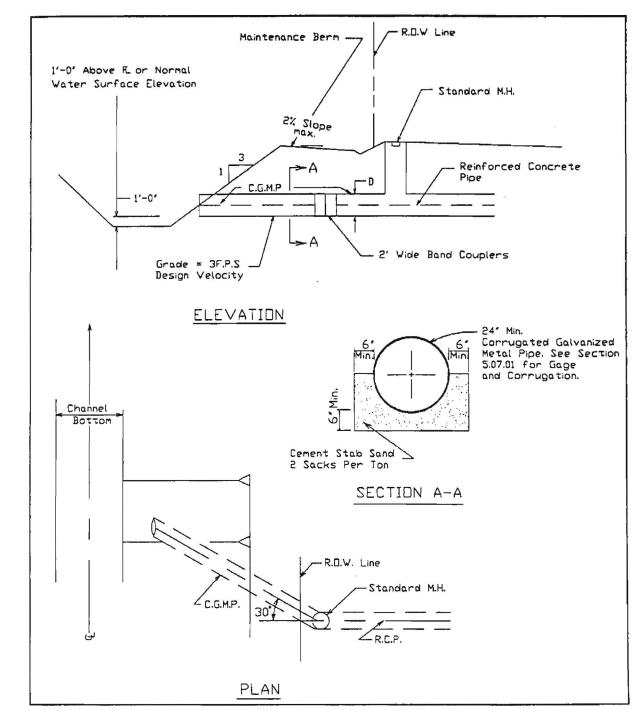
Typical Storm Sewer Outfall Structure (24-inch to 42-inch)
